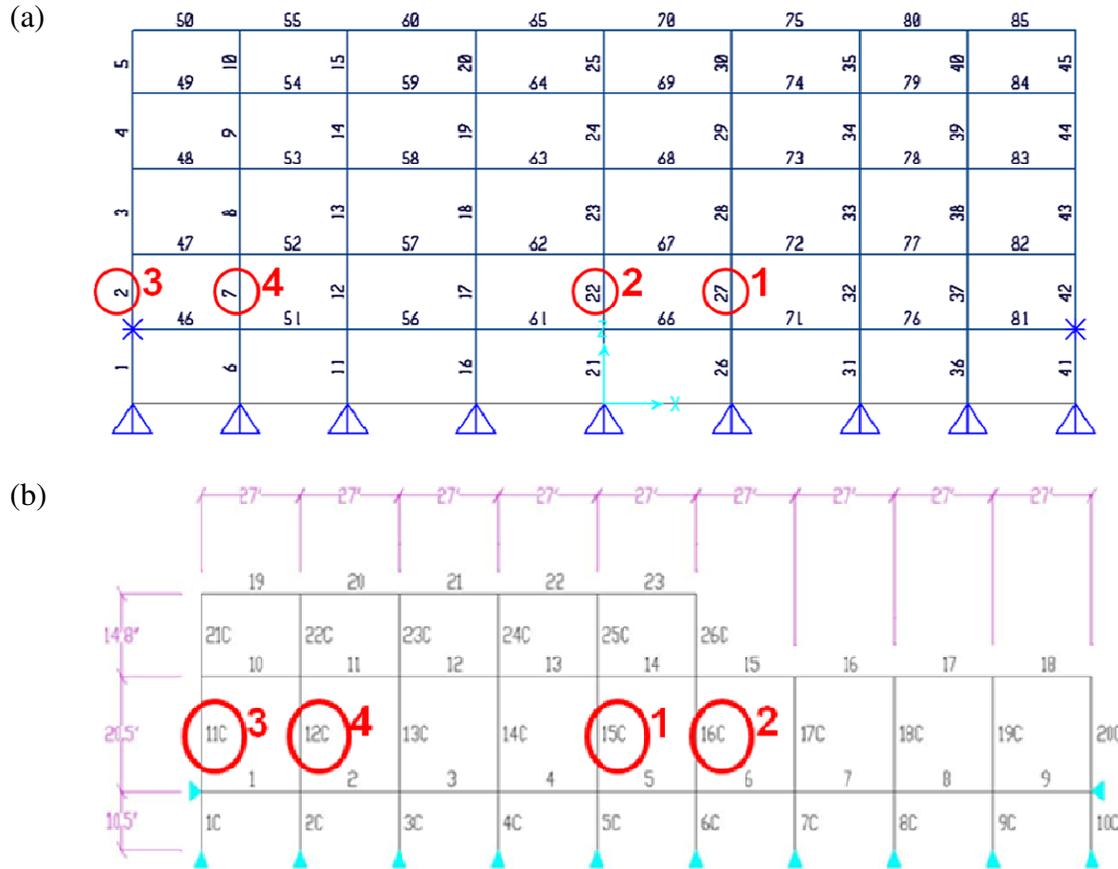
Two-Dimensional Model for the Longitudinal Perimeter Frames of (a) Ohio Union Building and (b) BLCC Building (Circled Columns were Removed in the Order Shown)
